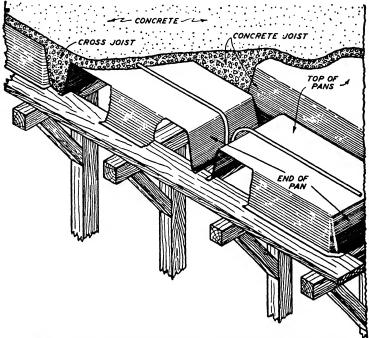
Method of Installing Outlet in a Cross-Joist by the Use of Pans
